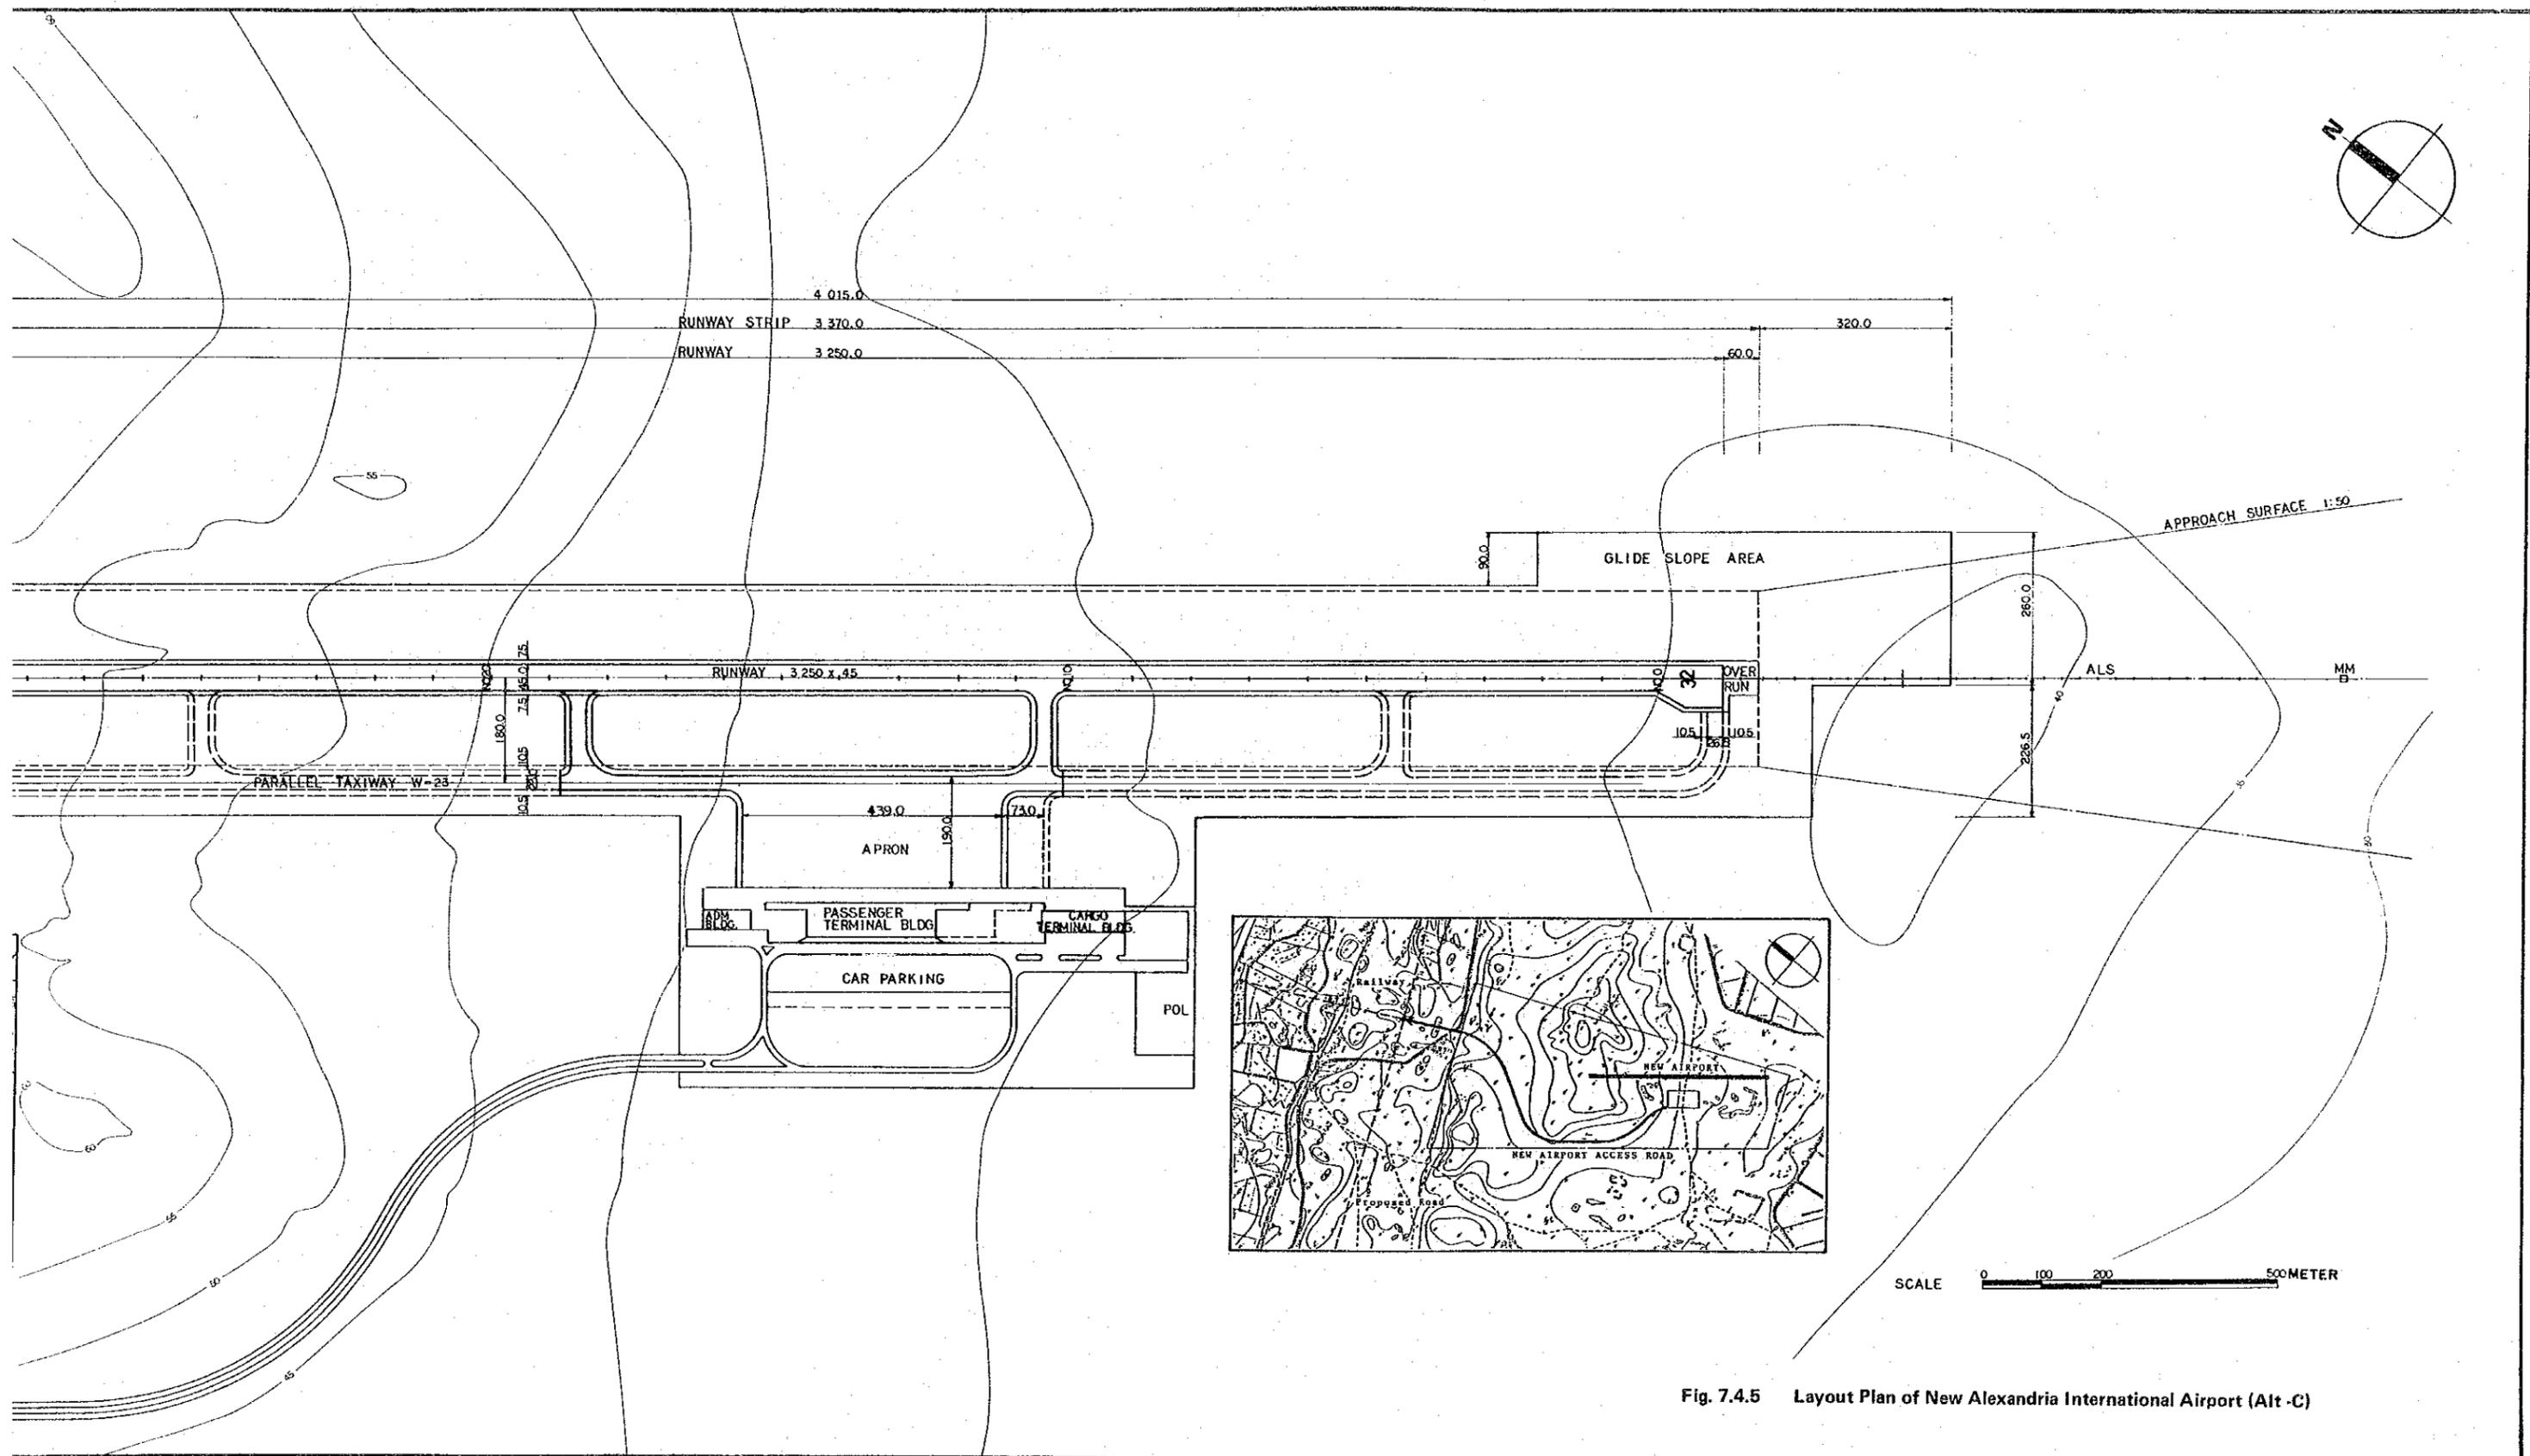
Layout Plan of New Alexandria International Airport (AIt-C)
